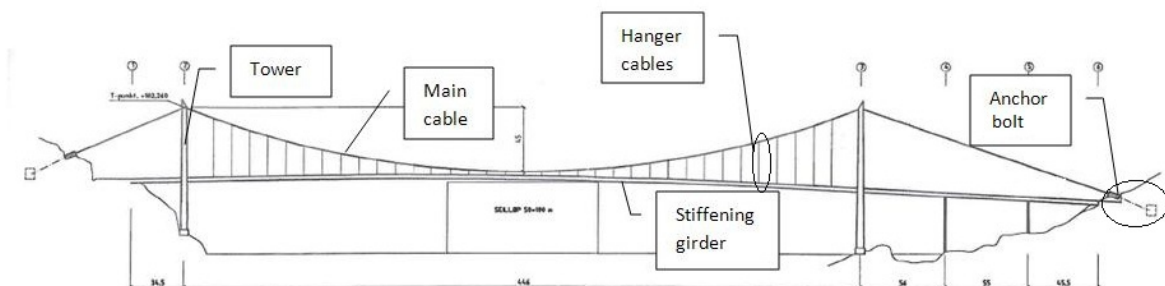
The main components of a suspension bridge shown on Lysefjord Bridge [7]
